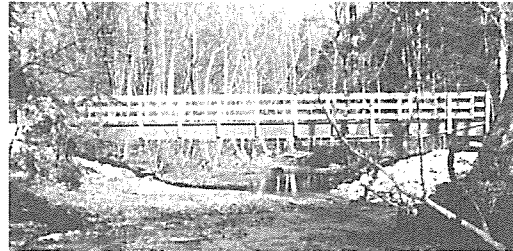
Hybrid FRP girder bridge with cable (photo: Strongwell)
